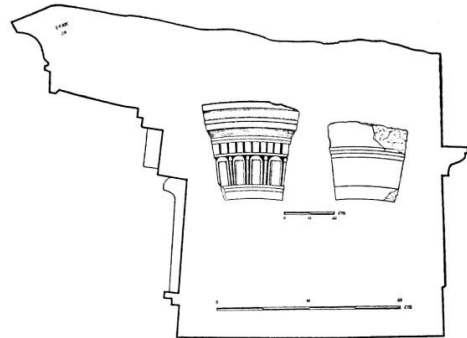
VOUSOIR FROM COLONNADED ENTRANCE TO ROOM 14 OF VILLA. G. R. H. Wright
